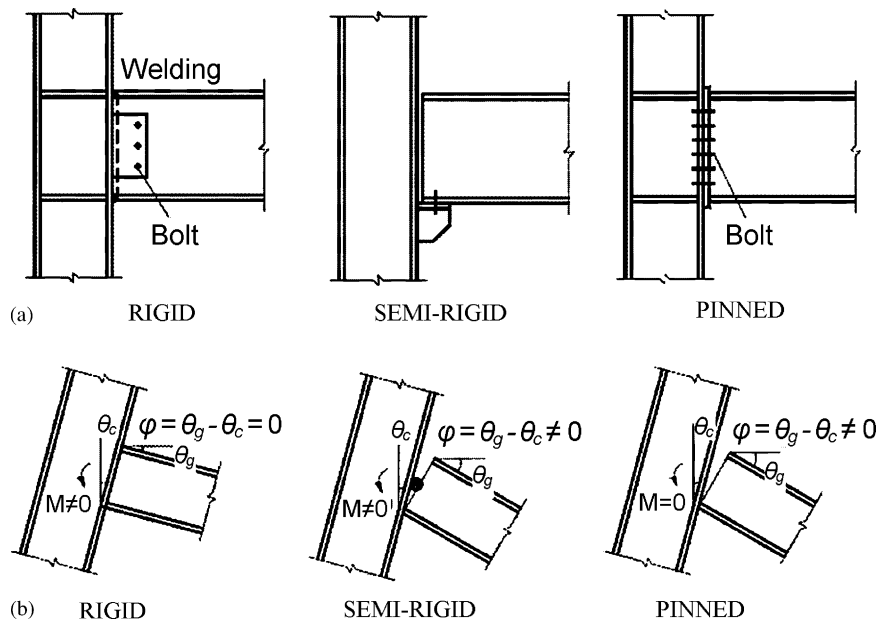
(a) Some typical configurations of beam-column connections in steel frames and (b) moment and rotations of beam-column connections (g, girder; c, column).
